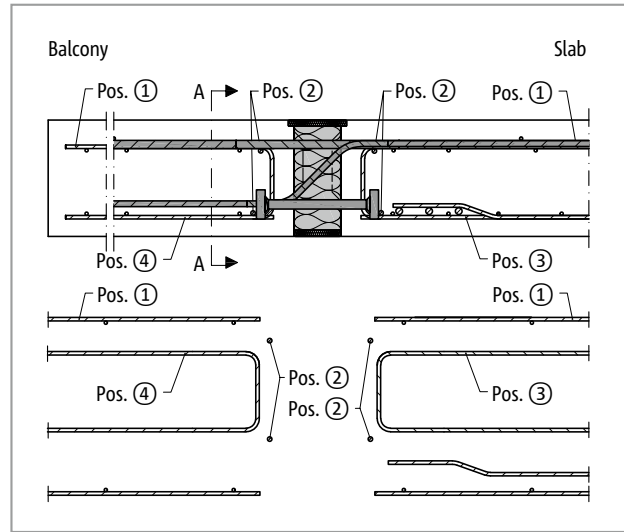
Schöck Isokorb® T type K-M12: On-site reinforcement with indirect support
